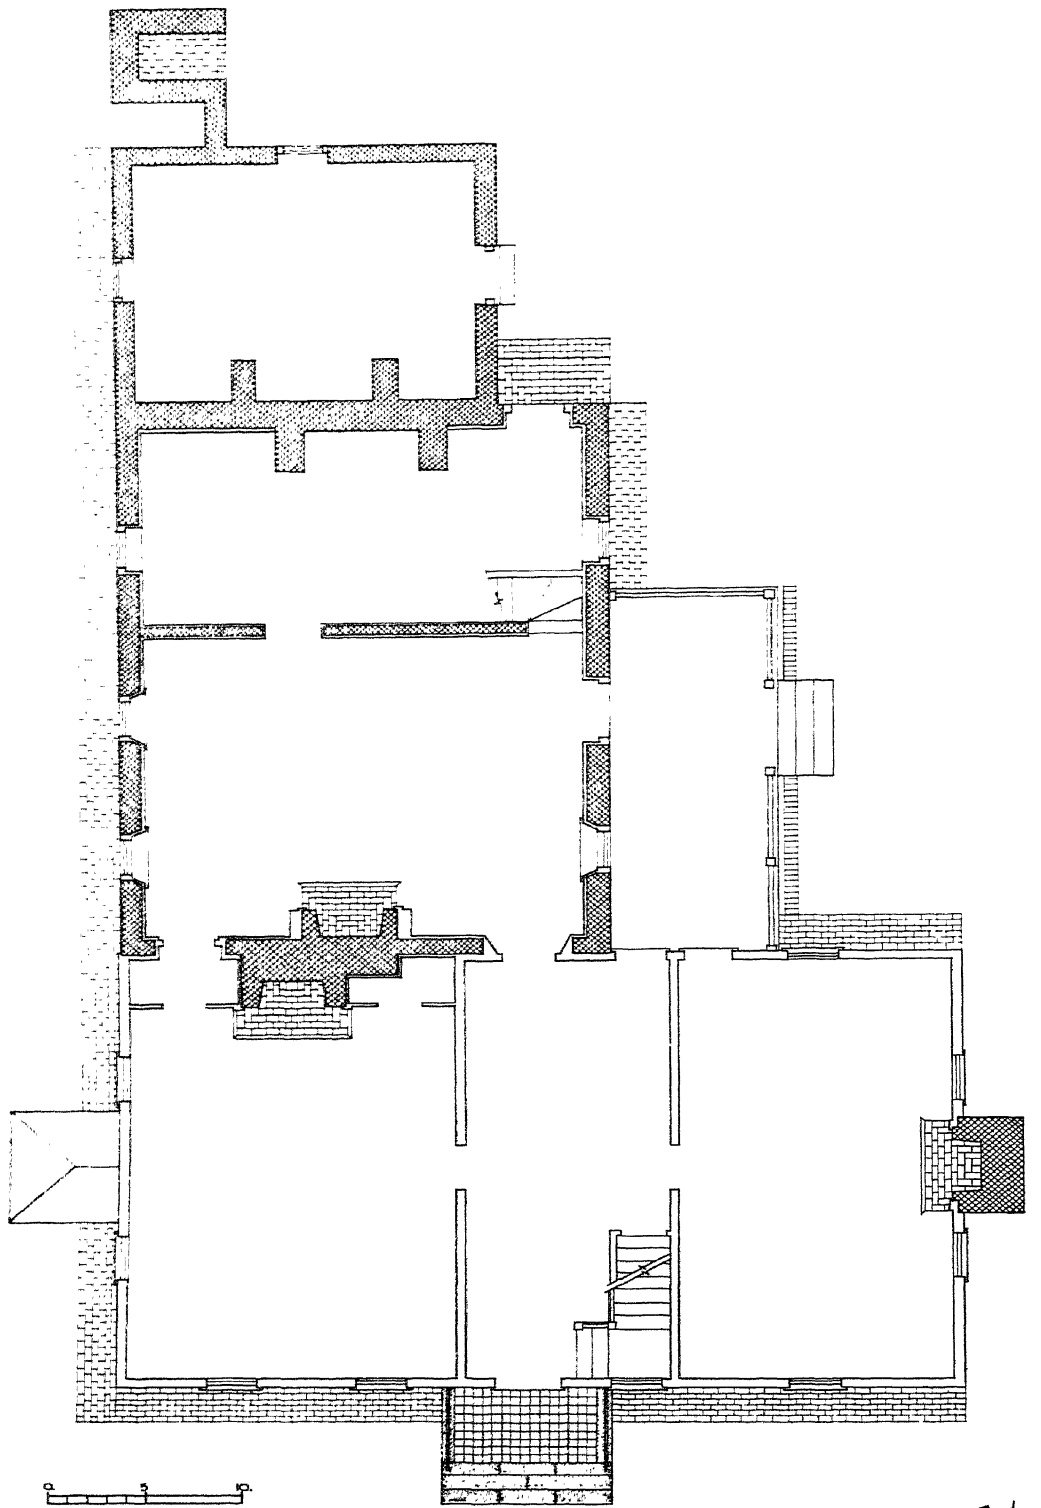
THE POWELL-WALLER HOUSE. Plan.
